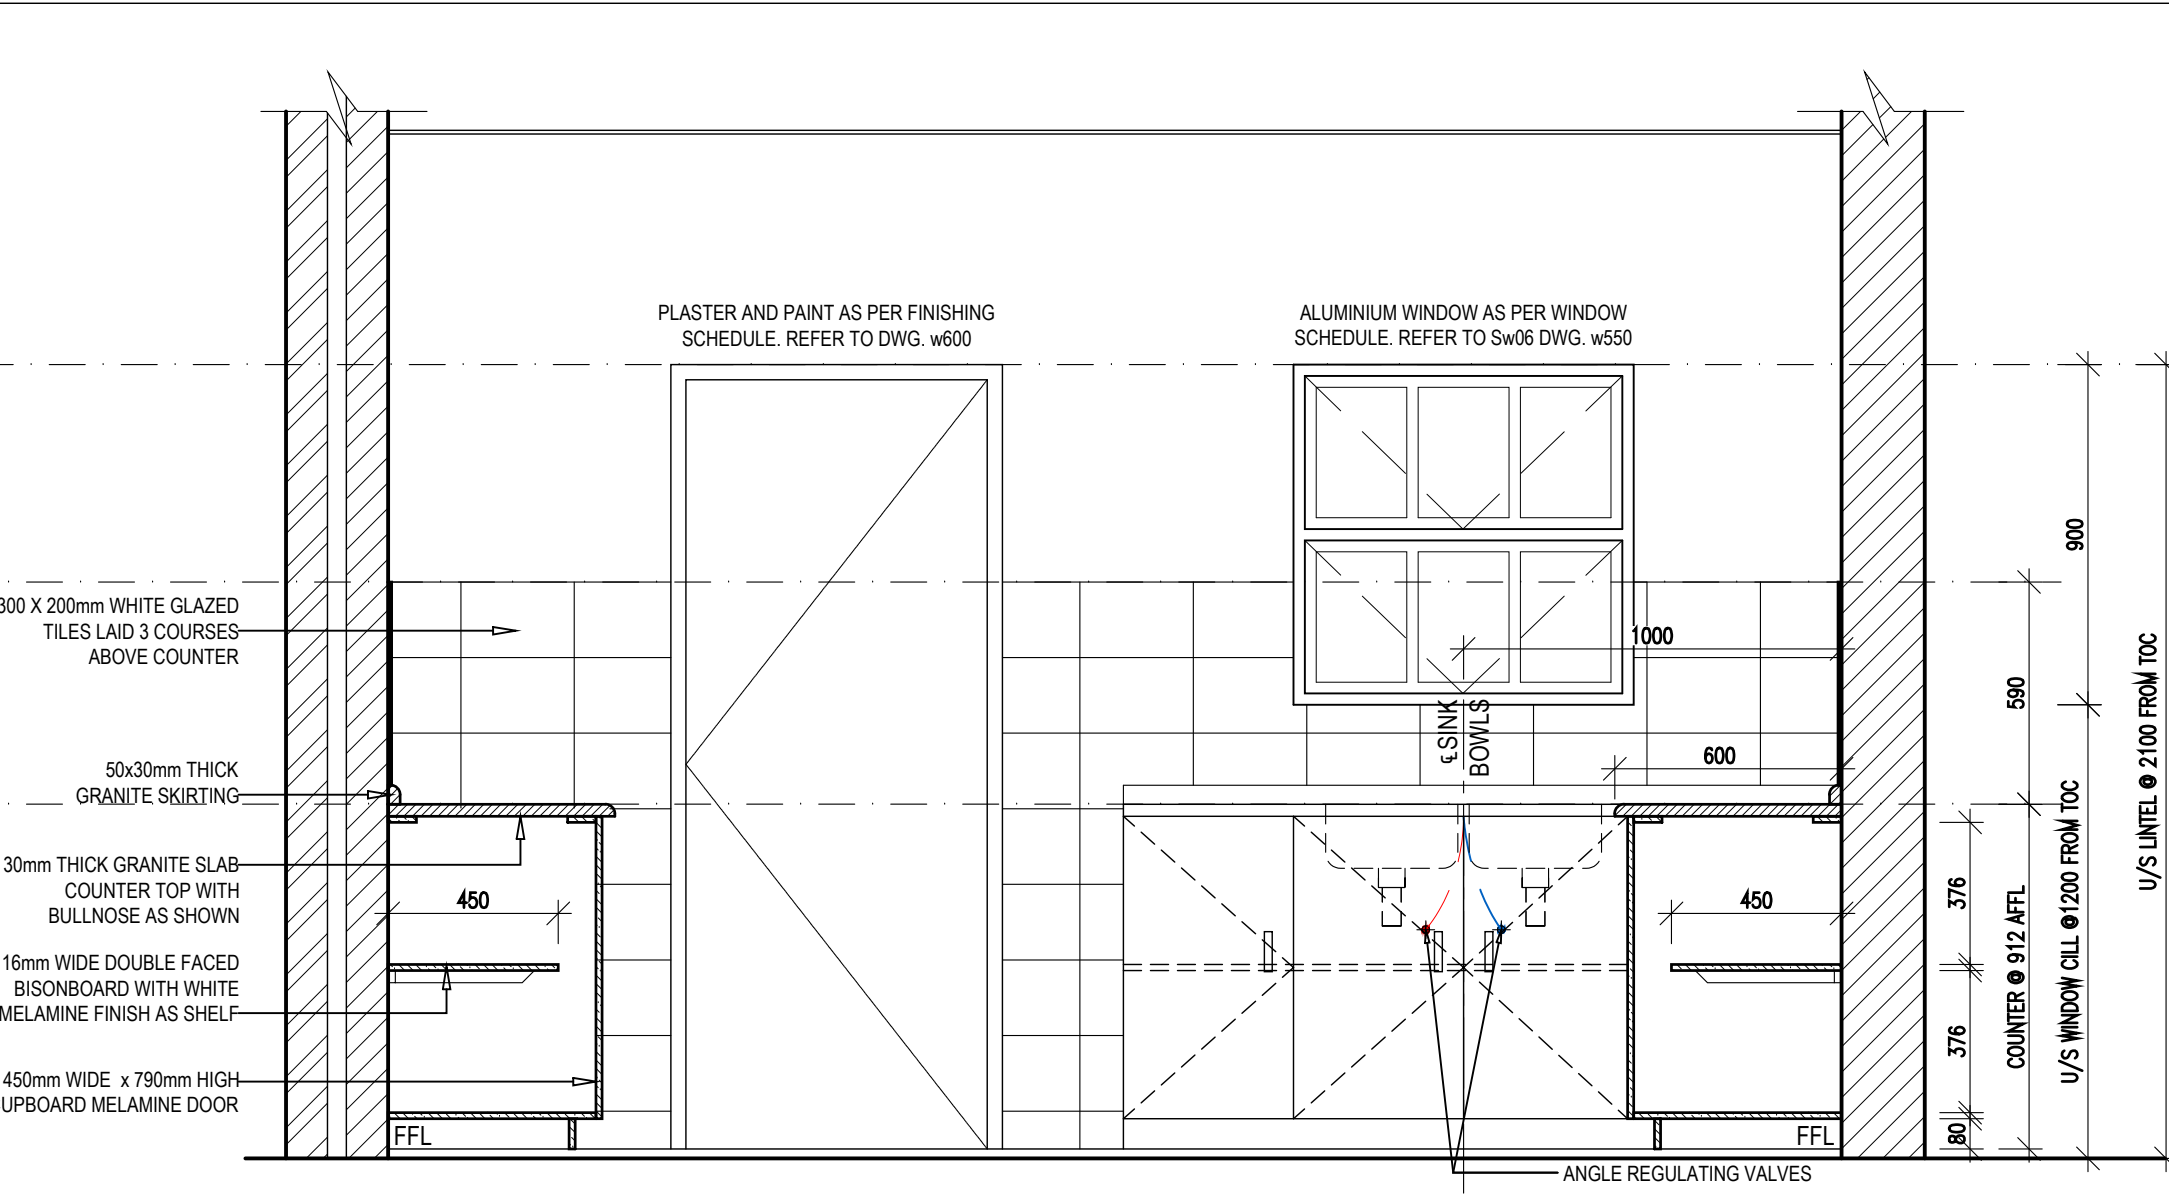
SECTIONAL ELEVATION A SCALE 1:20
